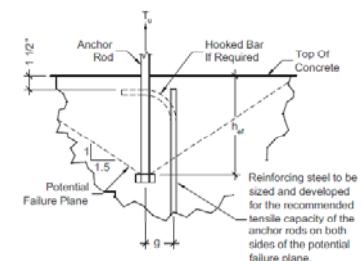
The Use of Steel Reinforcement for Developing Anchor Rods
